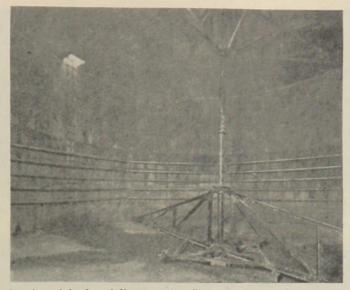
Interior view of fixed roof digester using Carter mechanism showing heavy duty spider castings connecting center shafting and truss.
